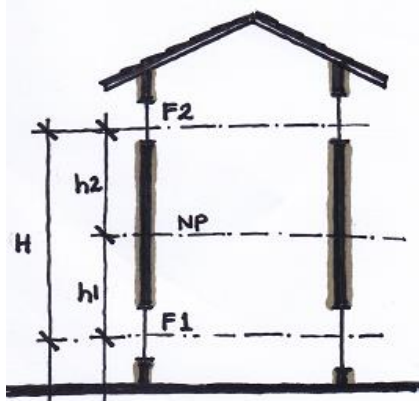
The pressure when at inlet and outlet are same is known as neutral plane.
